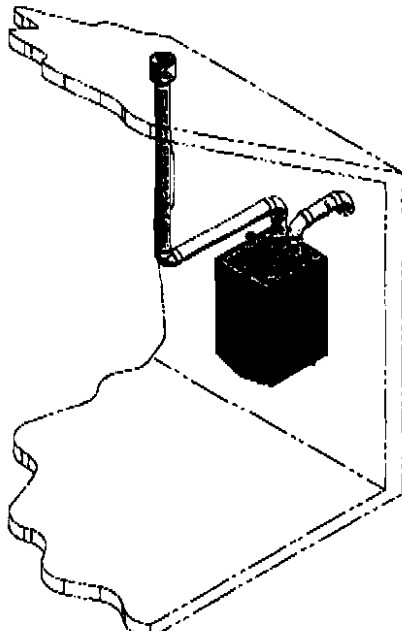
PVC/CPVC Vertical Vent, Sidewall Air
